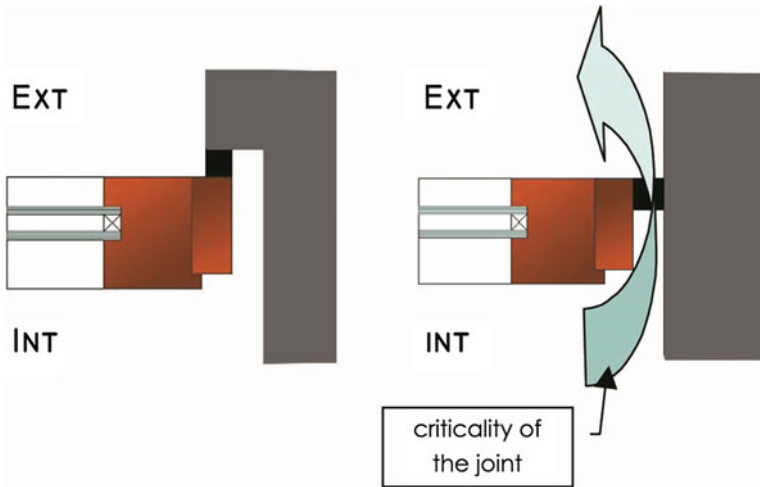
Example of a wall curb sill extruded over the jamb of the window frame (left) and window frame flashed along the exterior wall casing
